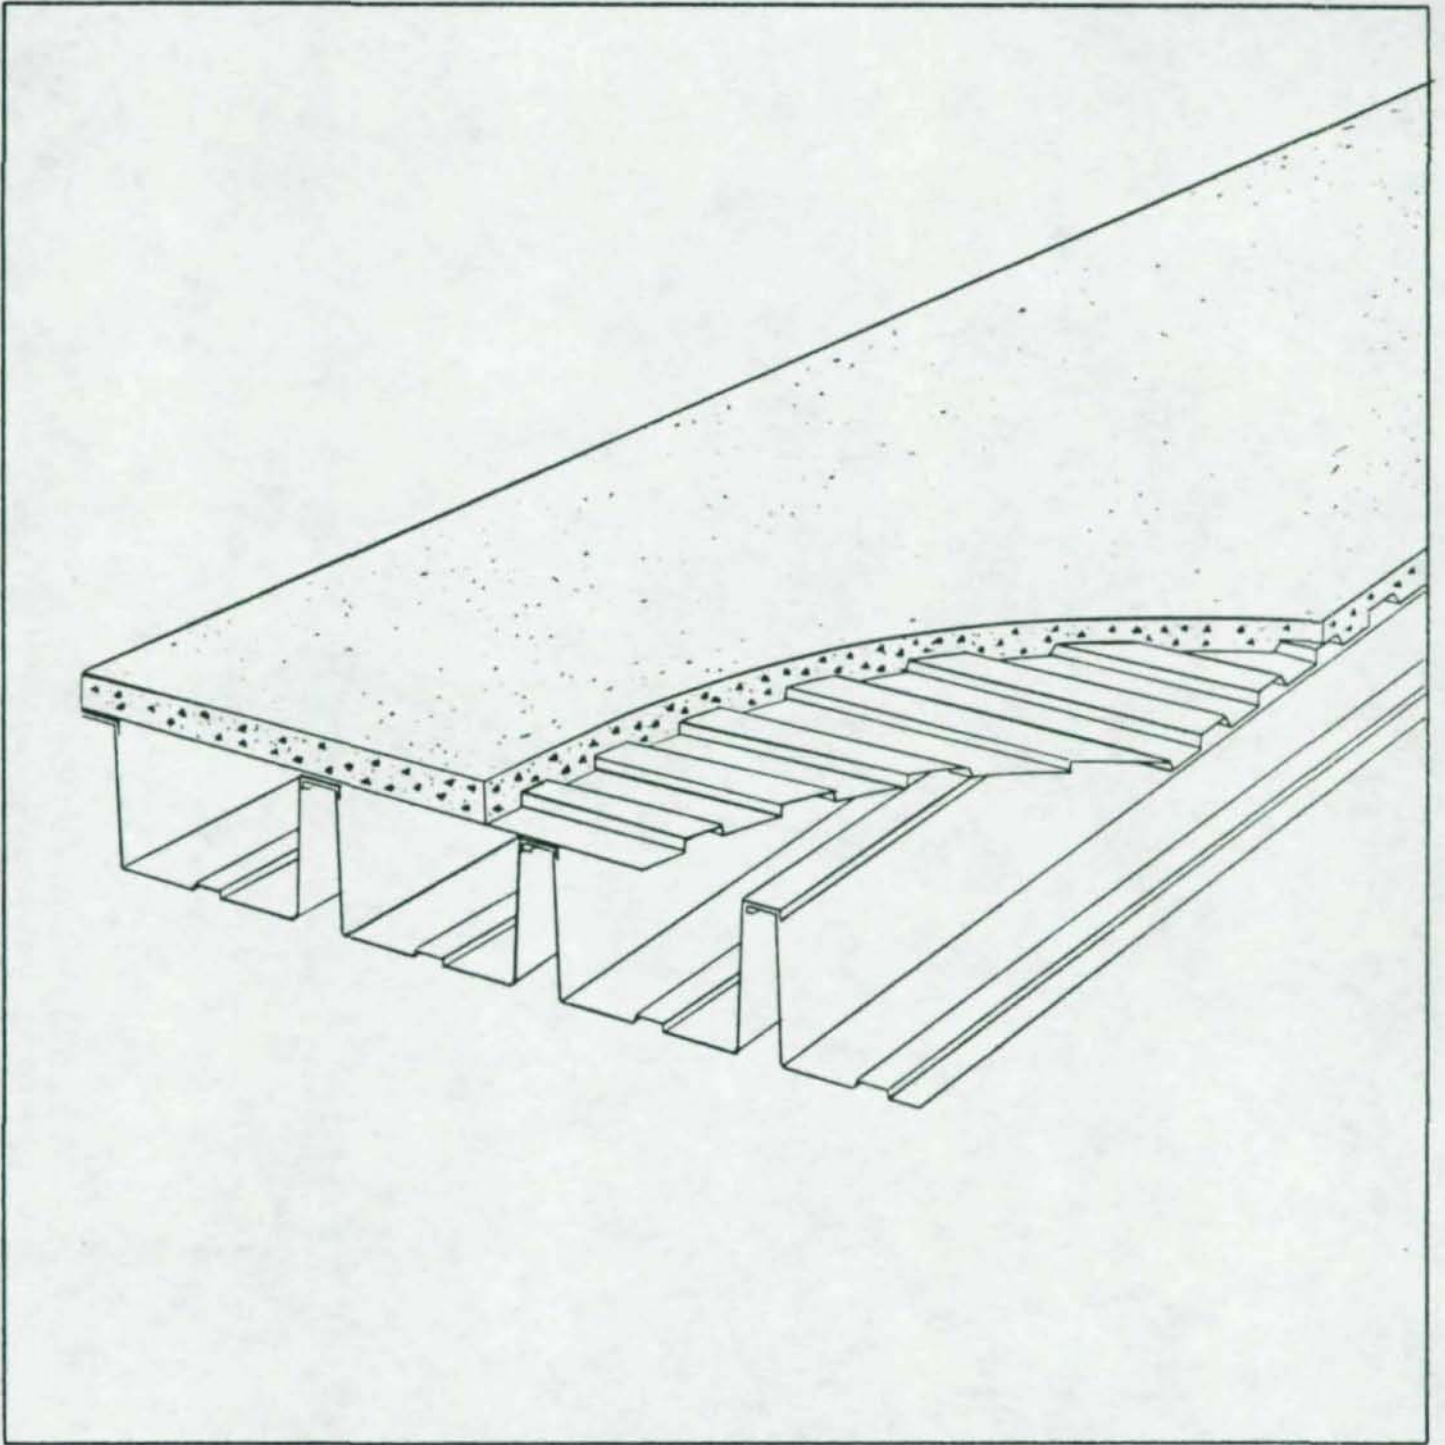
Long-Span Cold-Formed Deck/Concrete Slab Composite Floor System
